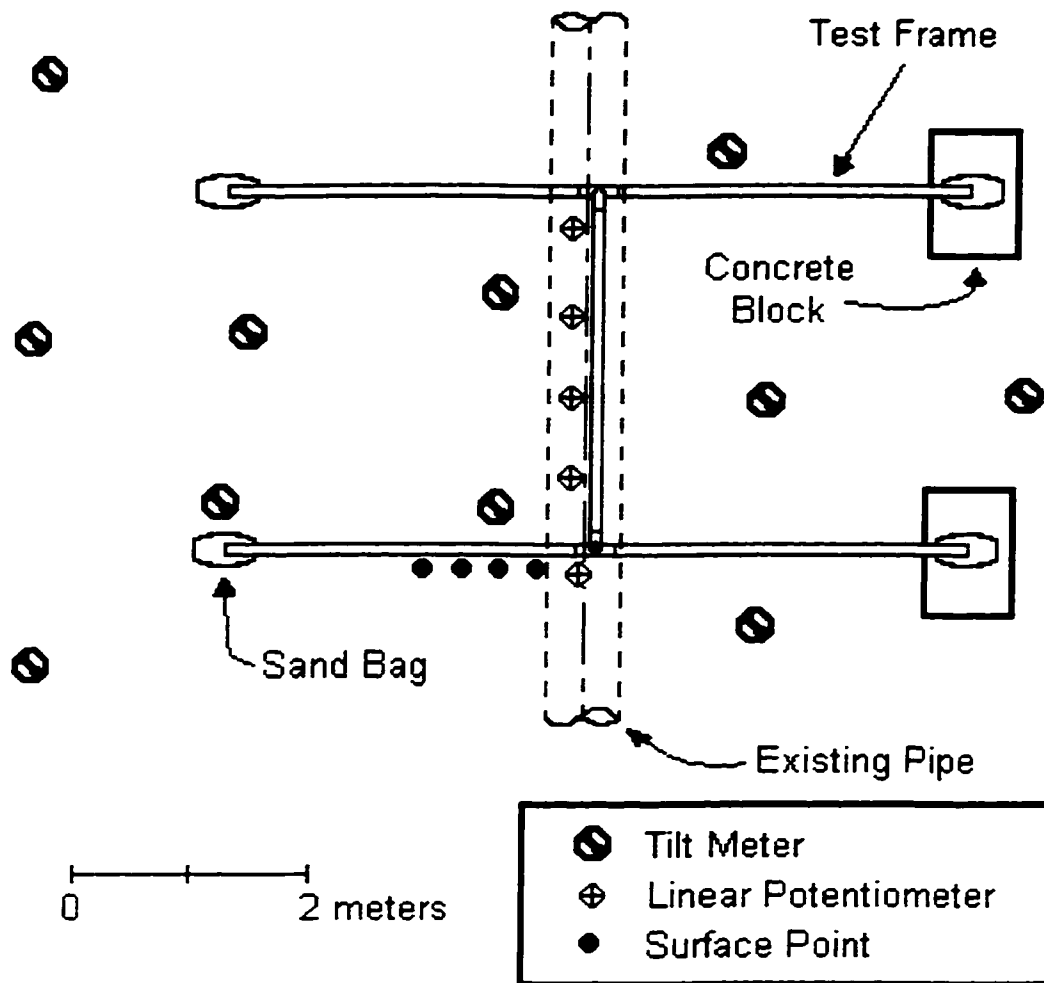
Site #1 Setup with Frame and Tilt Meters
